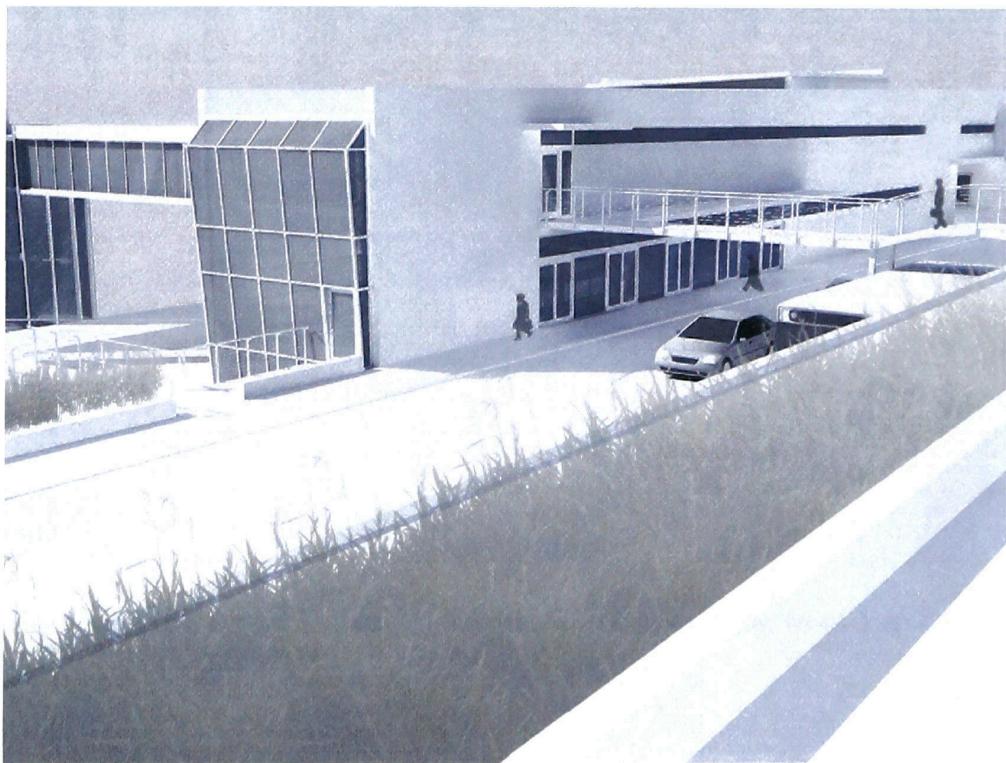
Model Showing Walkway From Top Parking Terrace to Station
